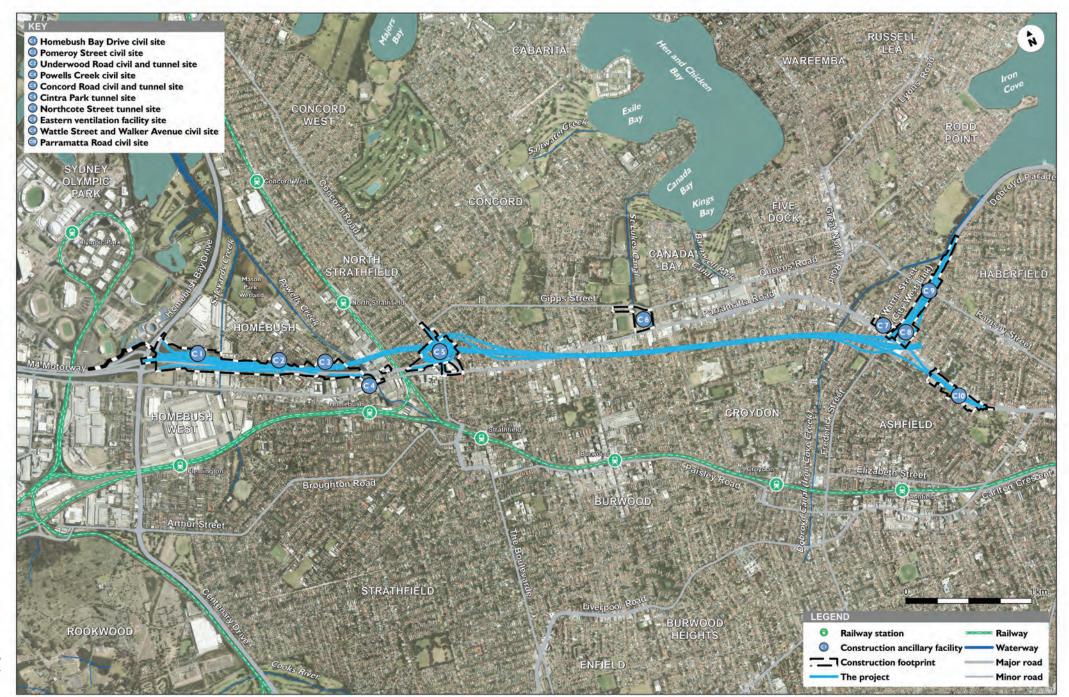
Overview of construction footprint and construction ancillary facilities
